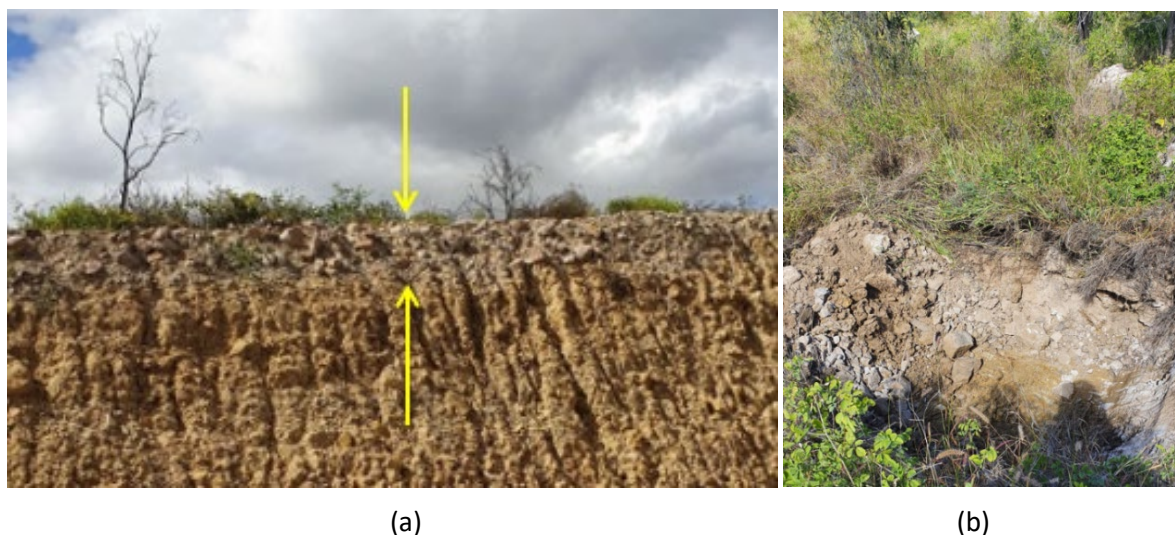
(a) Road cutting showing the rock clad surface (arrows) over spoil; (b) Close-up of a test pit showing the clay-rich underlying spoil on the test pit floor
